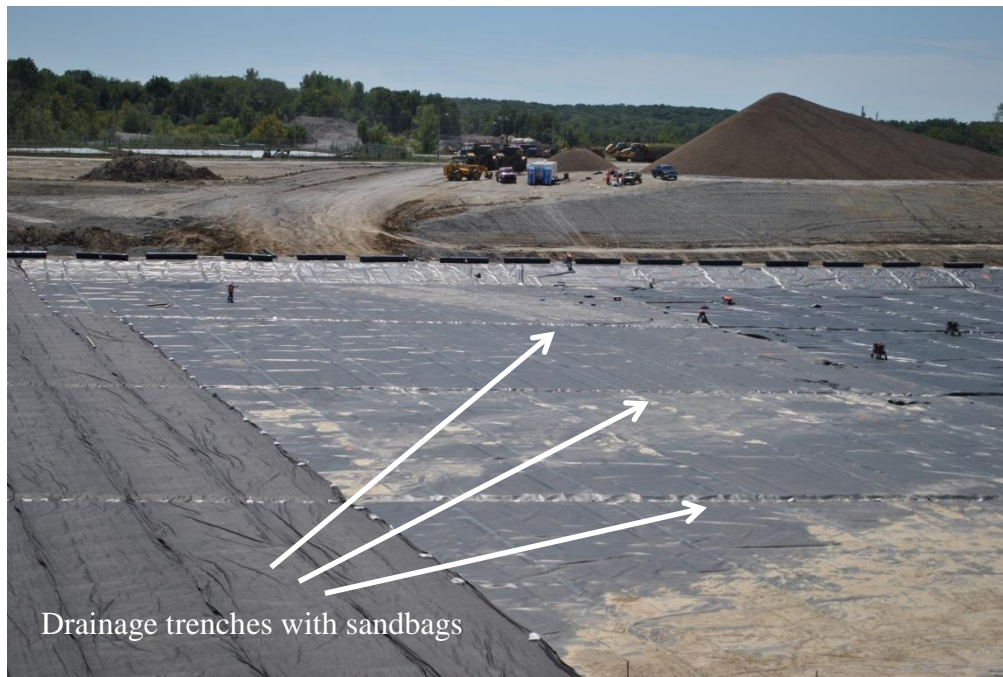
Zoomed-in view of geosynthetic liner, showing drainage trenches with sandbags in the trenches restraining movement of the liner.
